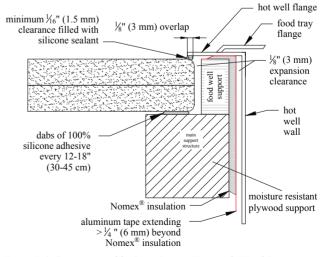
Cutout Assembly Cross Section View with Wood Support – Underlayment
